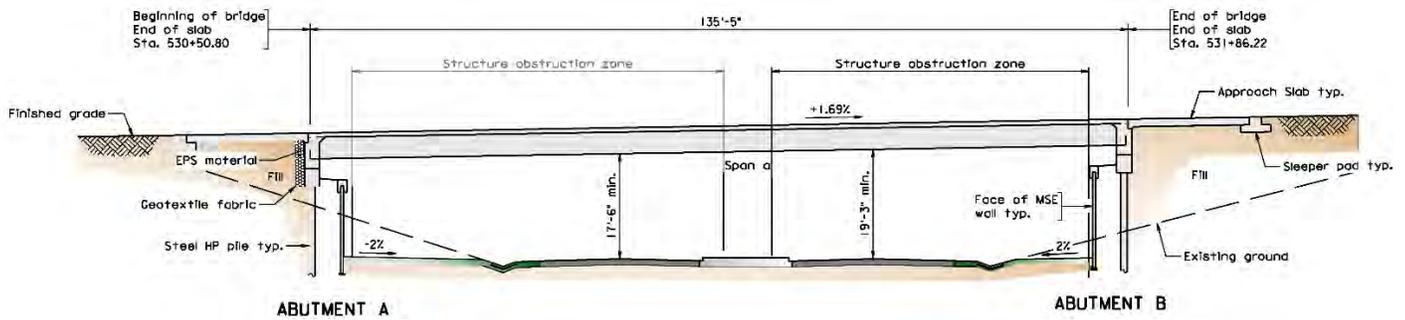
Elevation Section - I-81 Over Route 112 (Wildwood Road)
